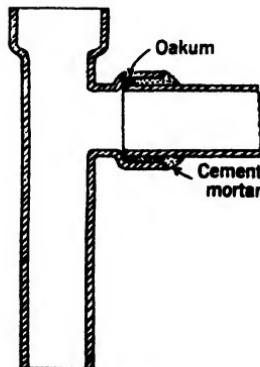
The inlet and outlet T's can be caulked with oakum and cement as shown. If cast-iron pipe is used an oakum and lead joint is better.
